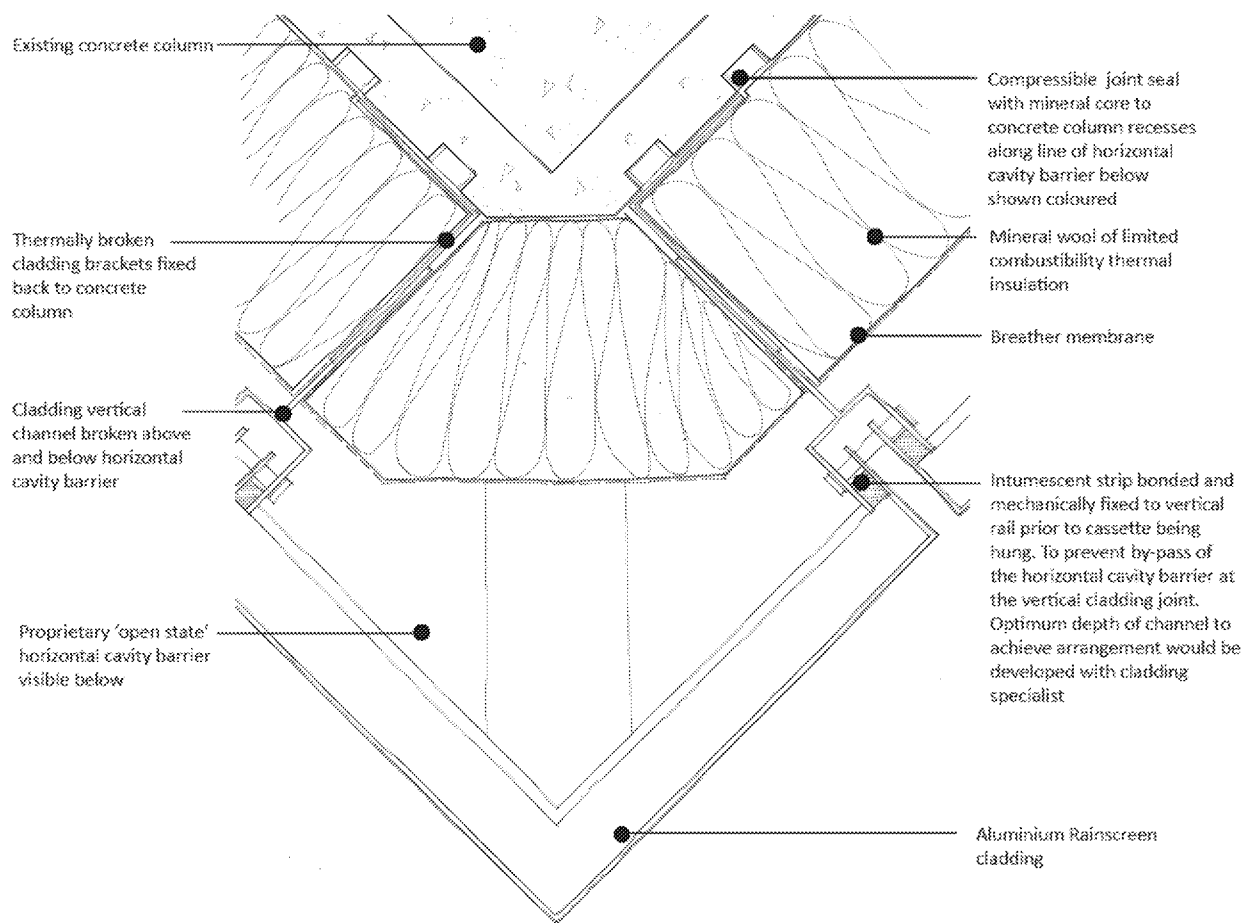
Typical Detail 6 – Plan detail through column ‘nose’
